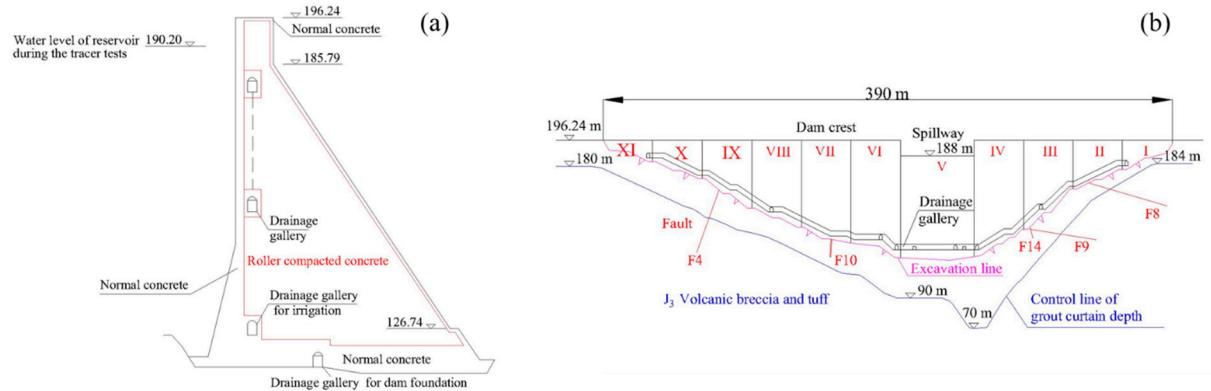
dam structure sketch: (a) profile of dam wall structure; (b) SW-NE cross section of dam structure.
